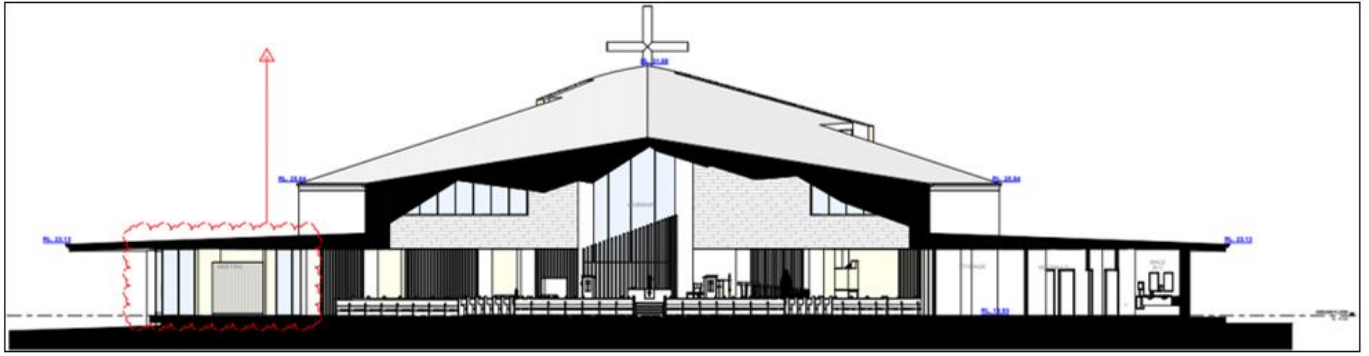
| Proposed changes to the church envelope illustrating addition of church offices (Source: Applicant’s RtS, 2026)
